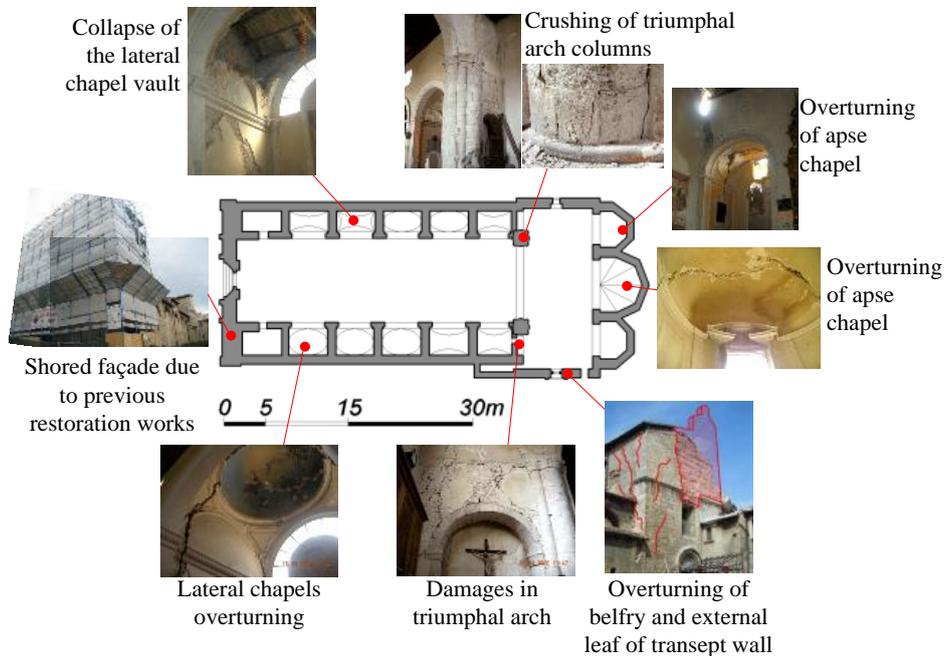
Santa Giusta church (SG): damage after the 6th April 2009 earthquake.
